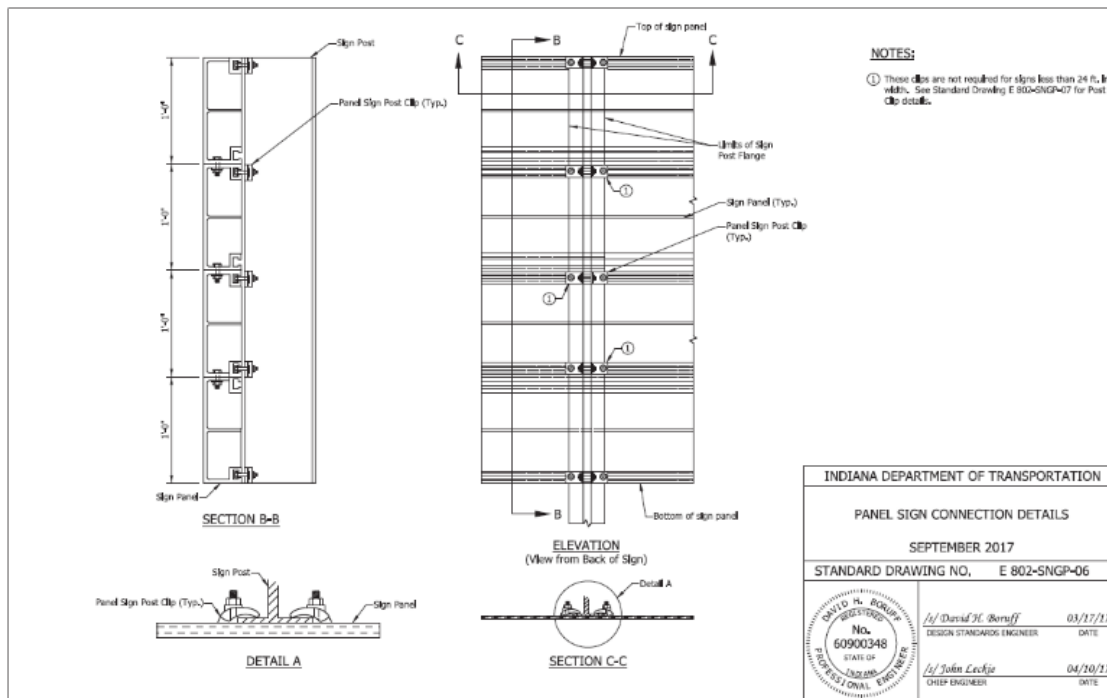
Panel Sign Connection Details (E 802-SNGP-06)
